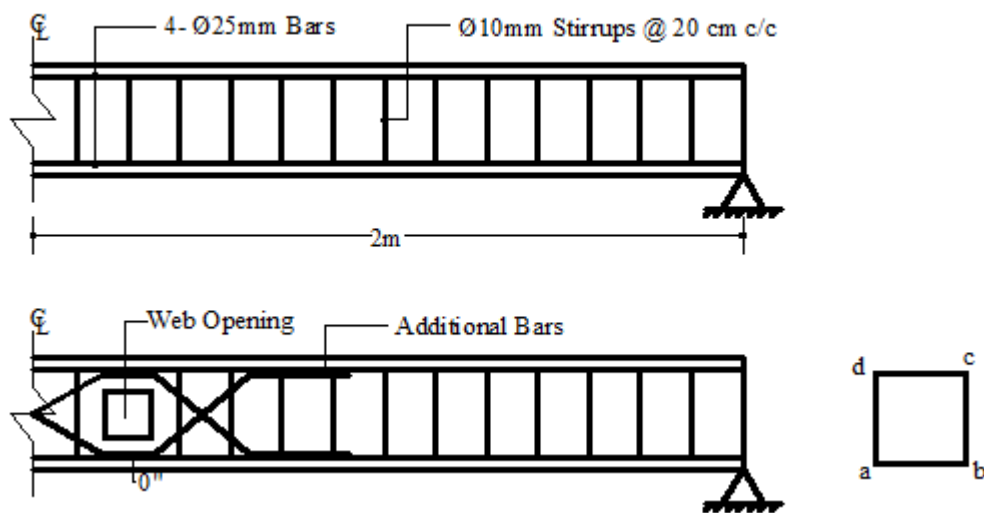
Details of Beam, Web Opening and Additional Reinforcement
